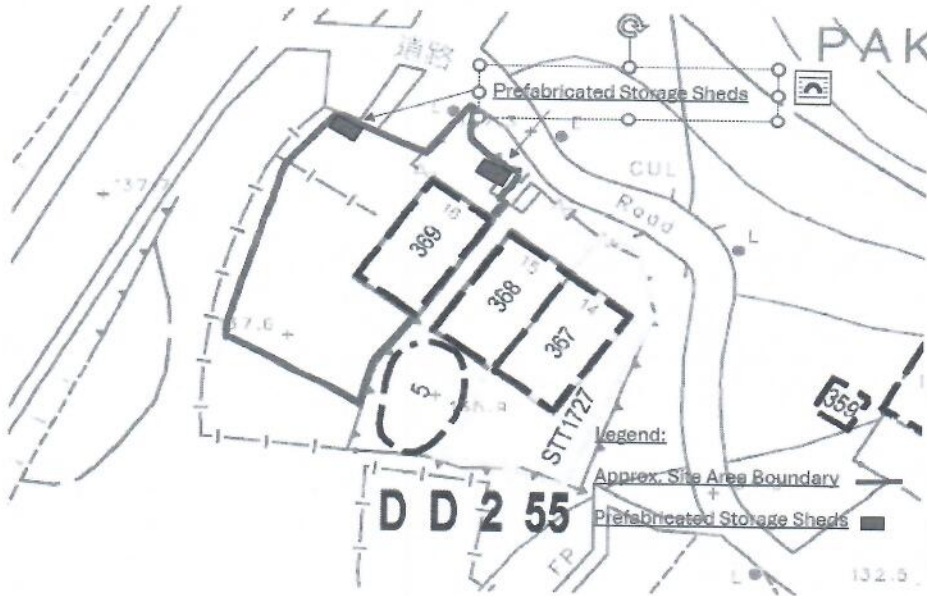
Boundary plan of the proposed temporary private garden, also showing the proposed location of two prefabricated storage sheds.
